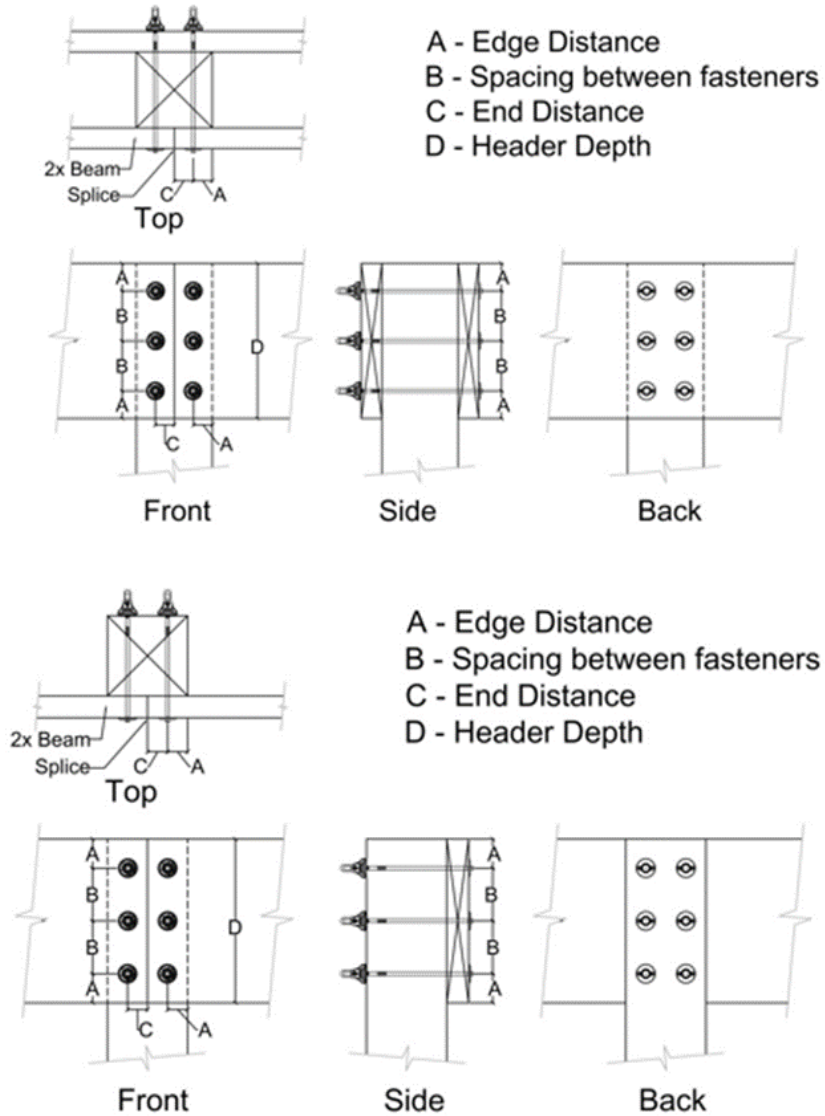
THRULOK™ SCREW BOLT FASTENING SYSTEM – EDGE, END, AND SPACING REQUIREMENTS
